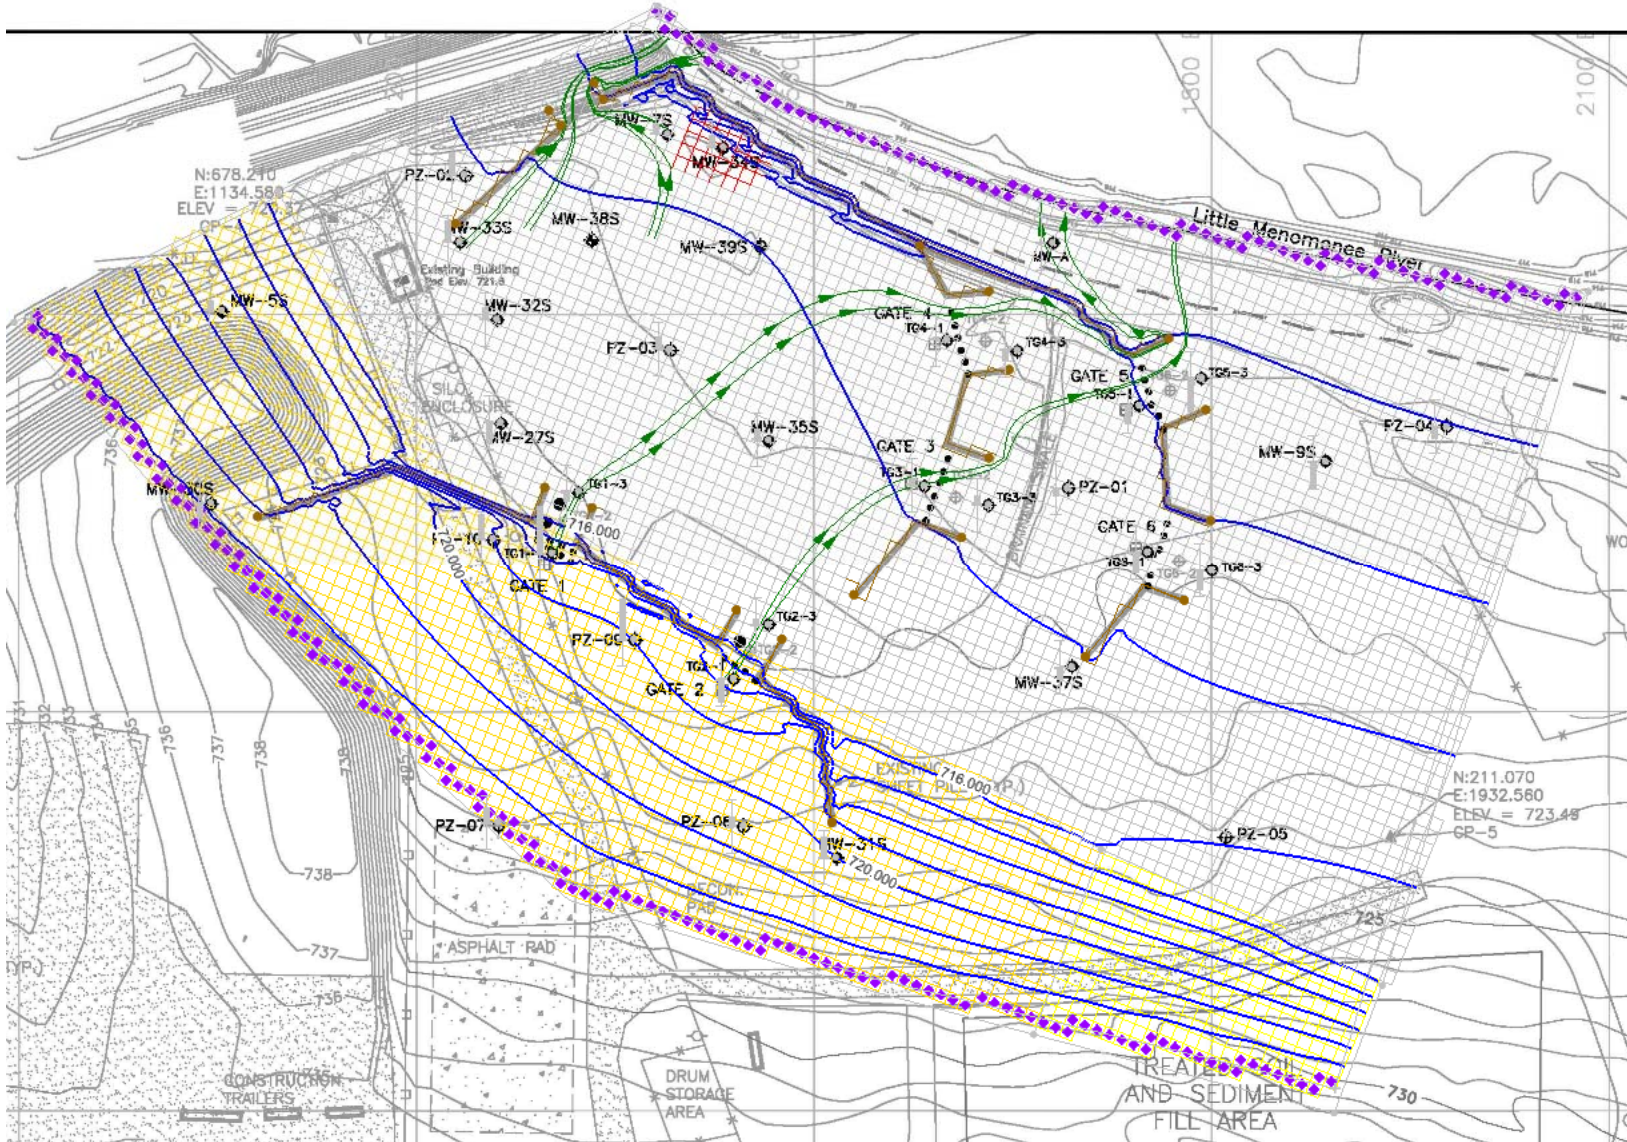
New Gate West of MW-7S, Excavation at MW-34S
